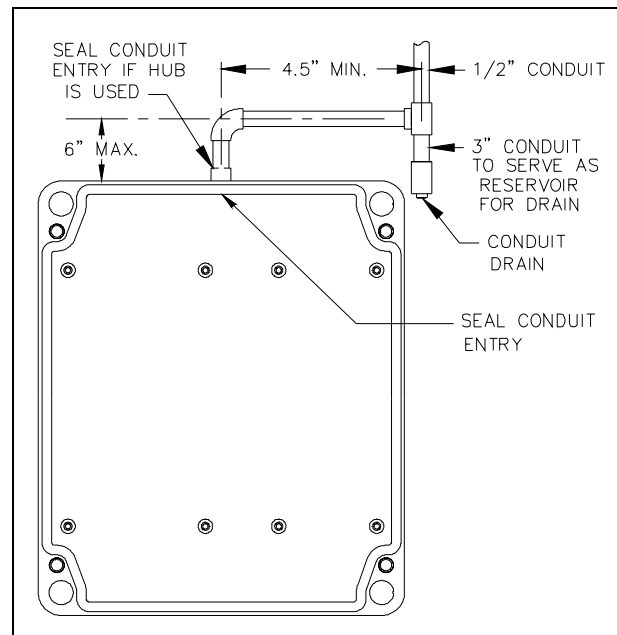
Top entry conduit installation details for metallic enclosures (NOT recommended)
